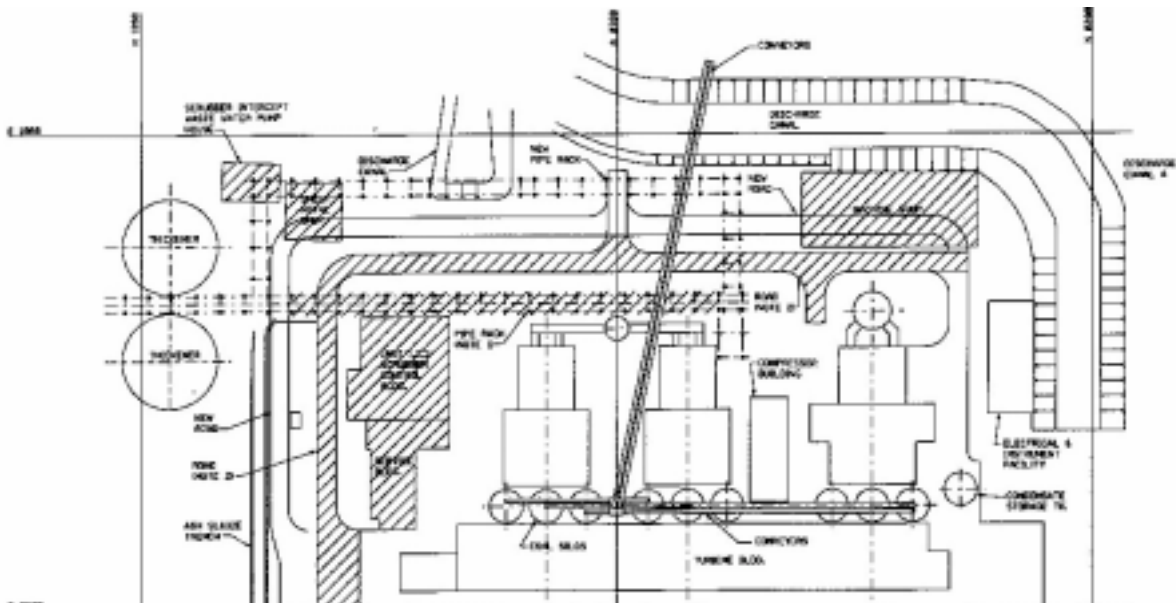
Units 1, 2, and 3 Initial Demolition and Site Construction
